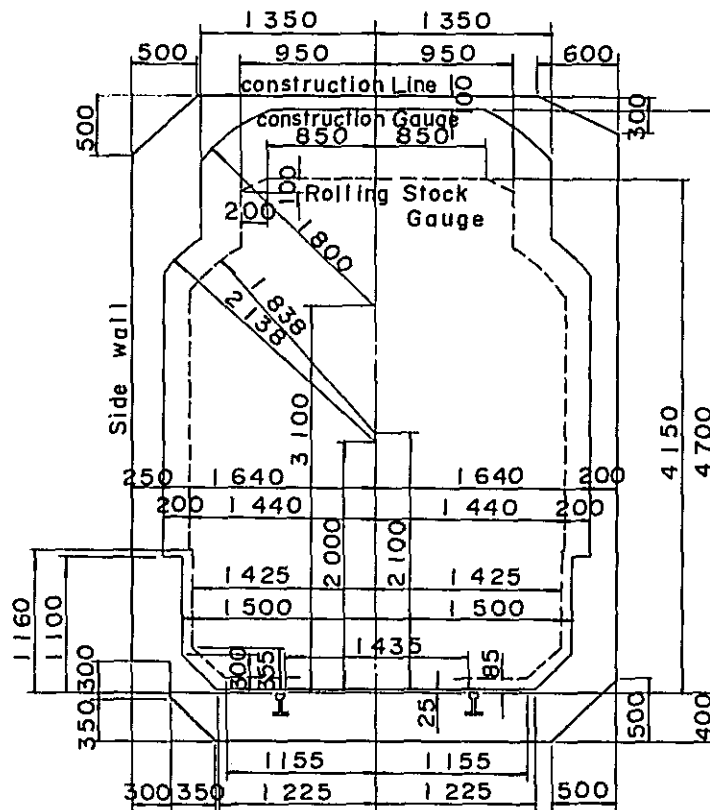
Construction Gauge and Rolling Stock Gauge.
